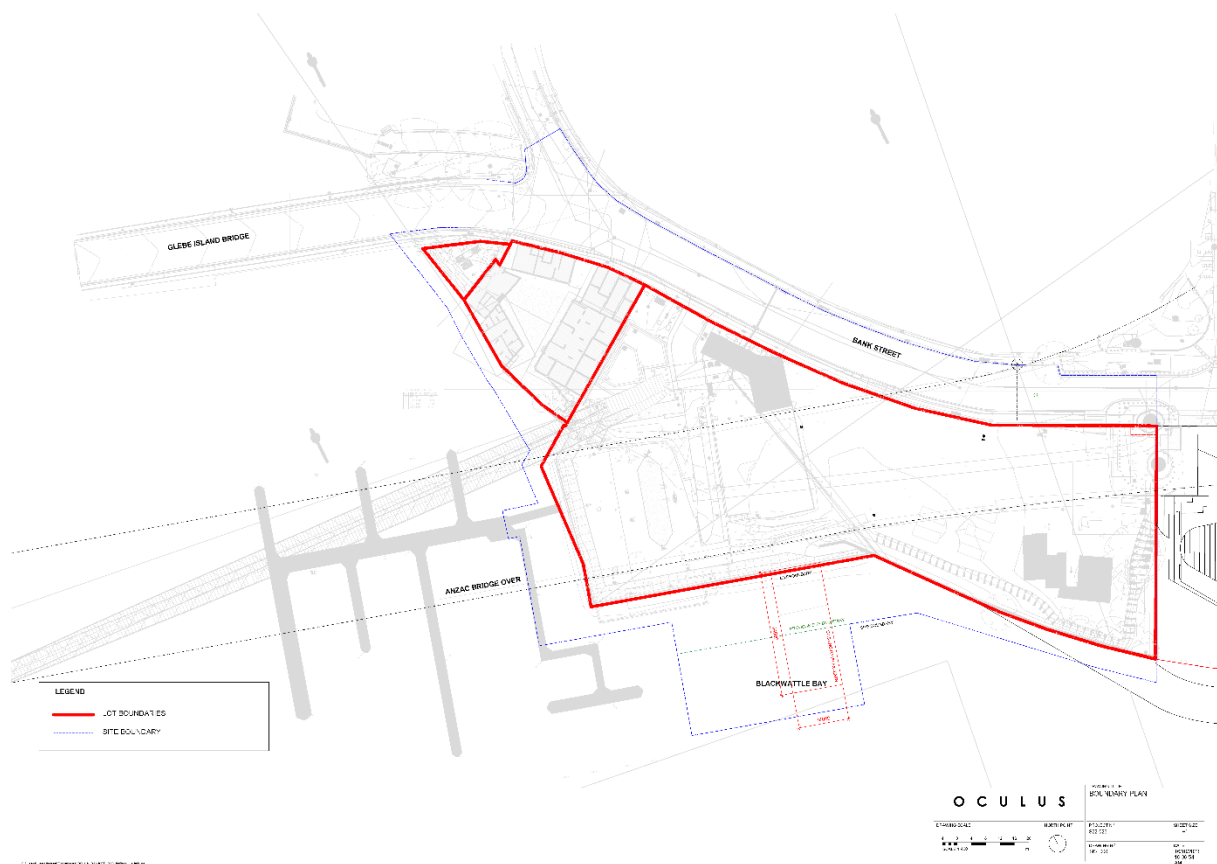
The boundary plan for the proposed Bank Street Park. Red indicates the lot boundaries boundary and blue indicates the site boundary. (Source: Oculus 2023)
